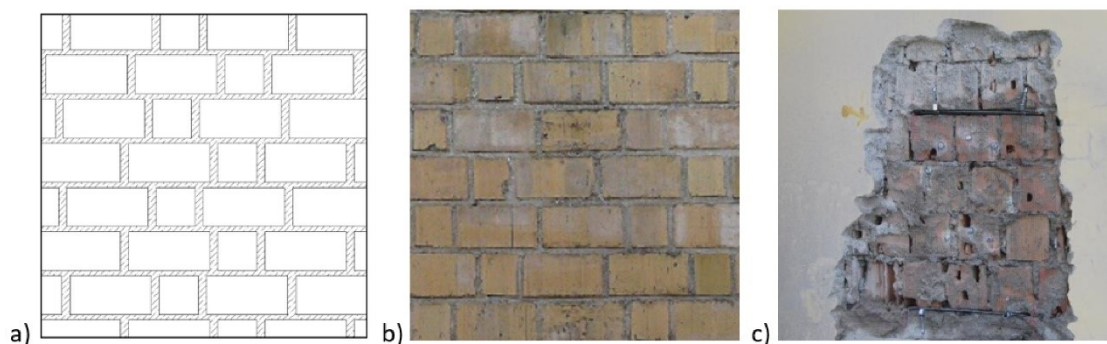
Clay hollow bricks with cement-based mortar (M8) – a) Graphic reconstruction of the wall texture type (1mx1m); b) Wall façade example of masonry panel with “good mortar”, photo taken in Cingoli (MC) [credits: CAP Studio]; c) Double flat-jack test execution on a masonry panel in “standard conditions”, photo taken in Frontino (PU) [credits: CAP Studio].
